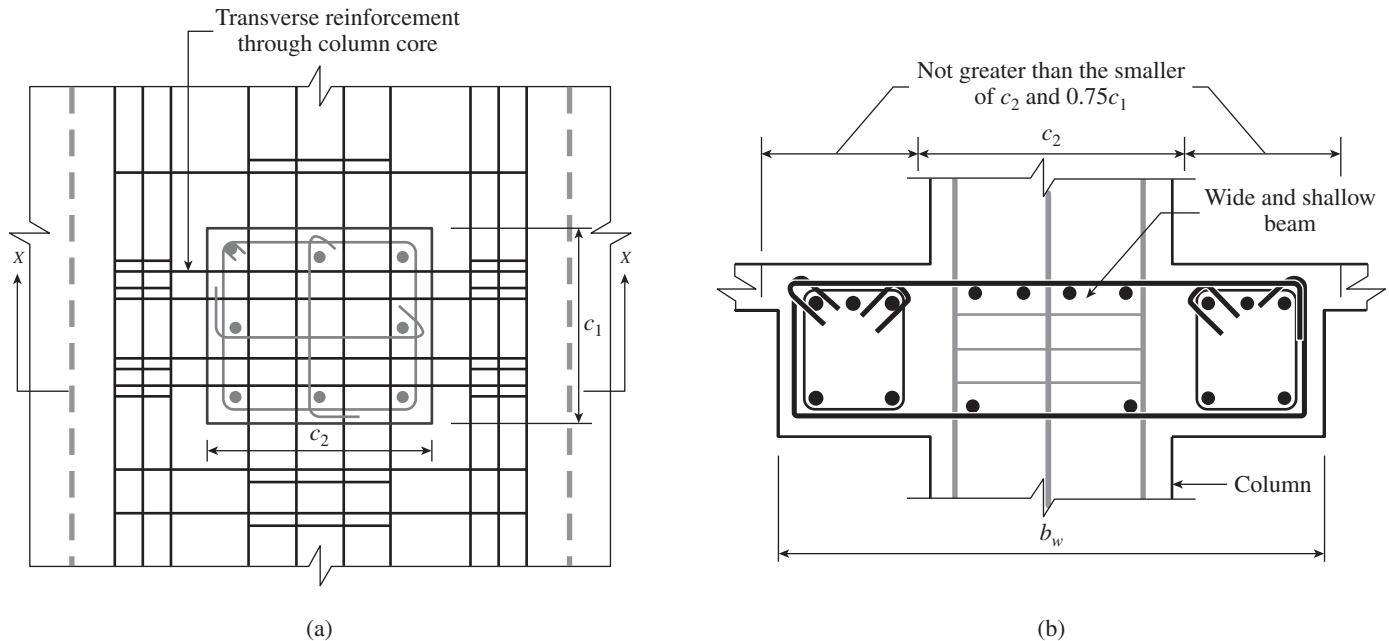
WSB and column joint (ACI 318) (a) Plan (b) Section X-X (Reprinted with permission from ACI)
